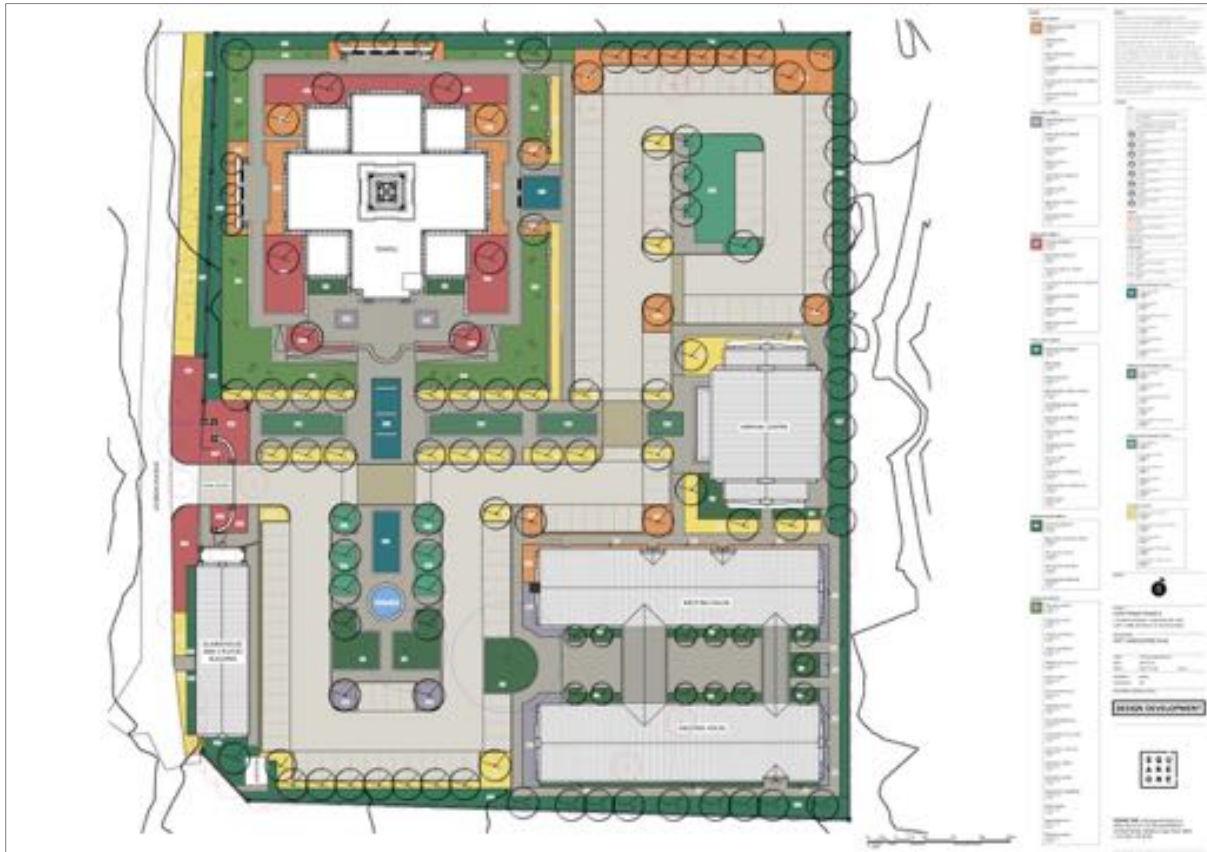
Concept Landscape Plan, existing trees along Liesbeek Avenue, and large trees on site are retained.
